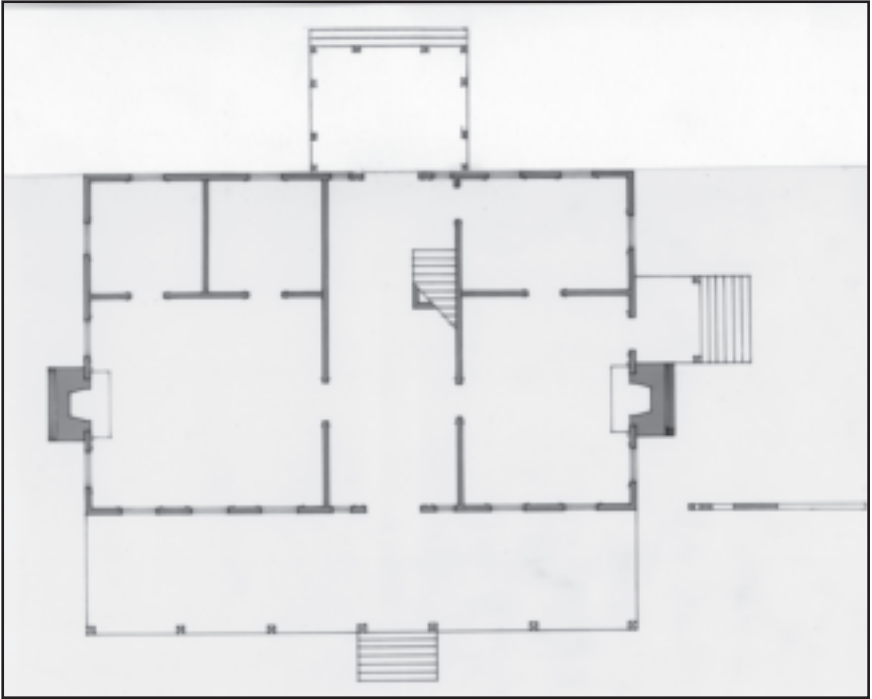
Plan of main floor of The Thomas Batchelor House, 1827
